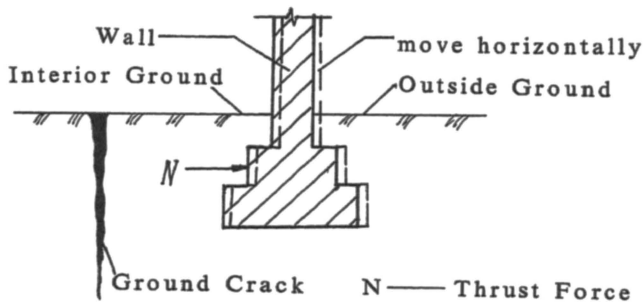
Ground Crack Occurs Near Foundation Parallelly
